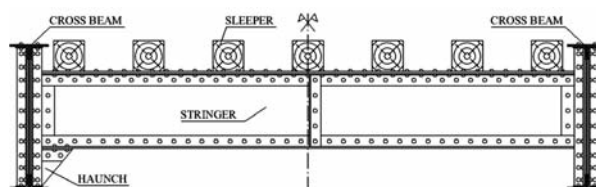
Arrangement of a typical stringer to cross-beam connection with/without reinforcing haunches
